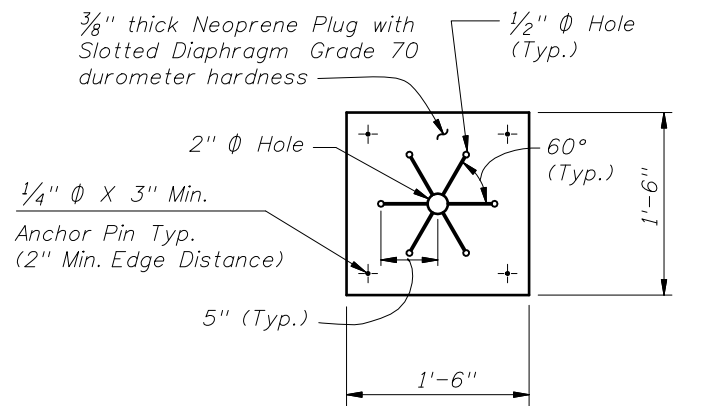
DETAIL "B" - SECTION AT INTERMEDIATE OPEN JOINT
